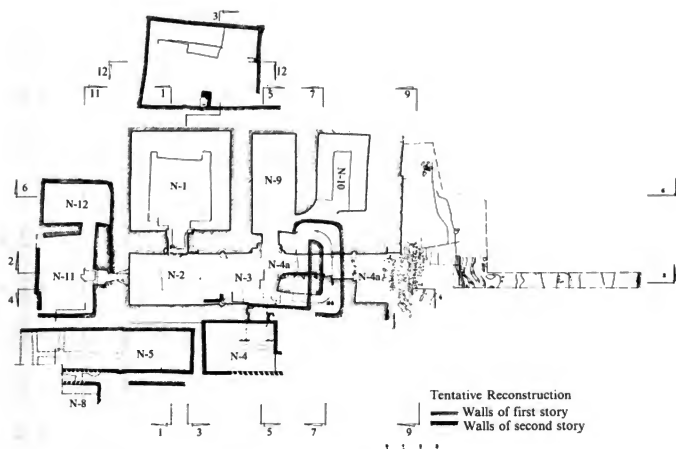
Plan of Panjikent XXIV, Rooms 1-4, 6, 9, 10 are included in one dwelling (1: hall, 2-3: corridor, 4: civān). The murals were situated in Rooms 1-4, on the second story above the civān, and above Room 10.
